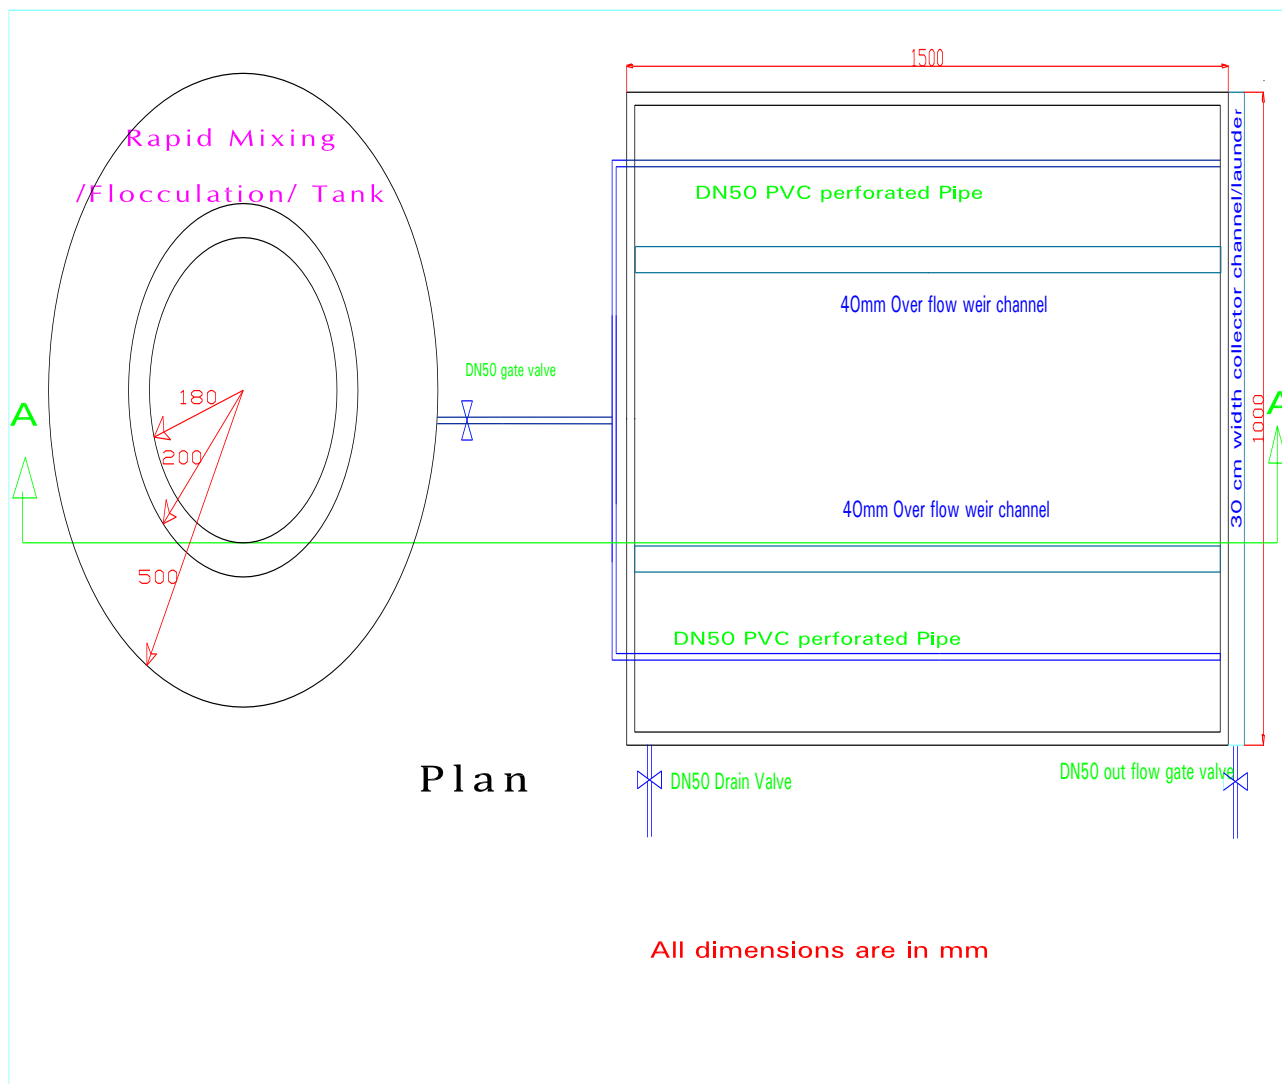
The detail drawings of the pilot scale treatment plant (plan view)
